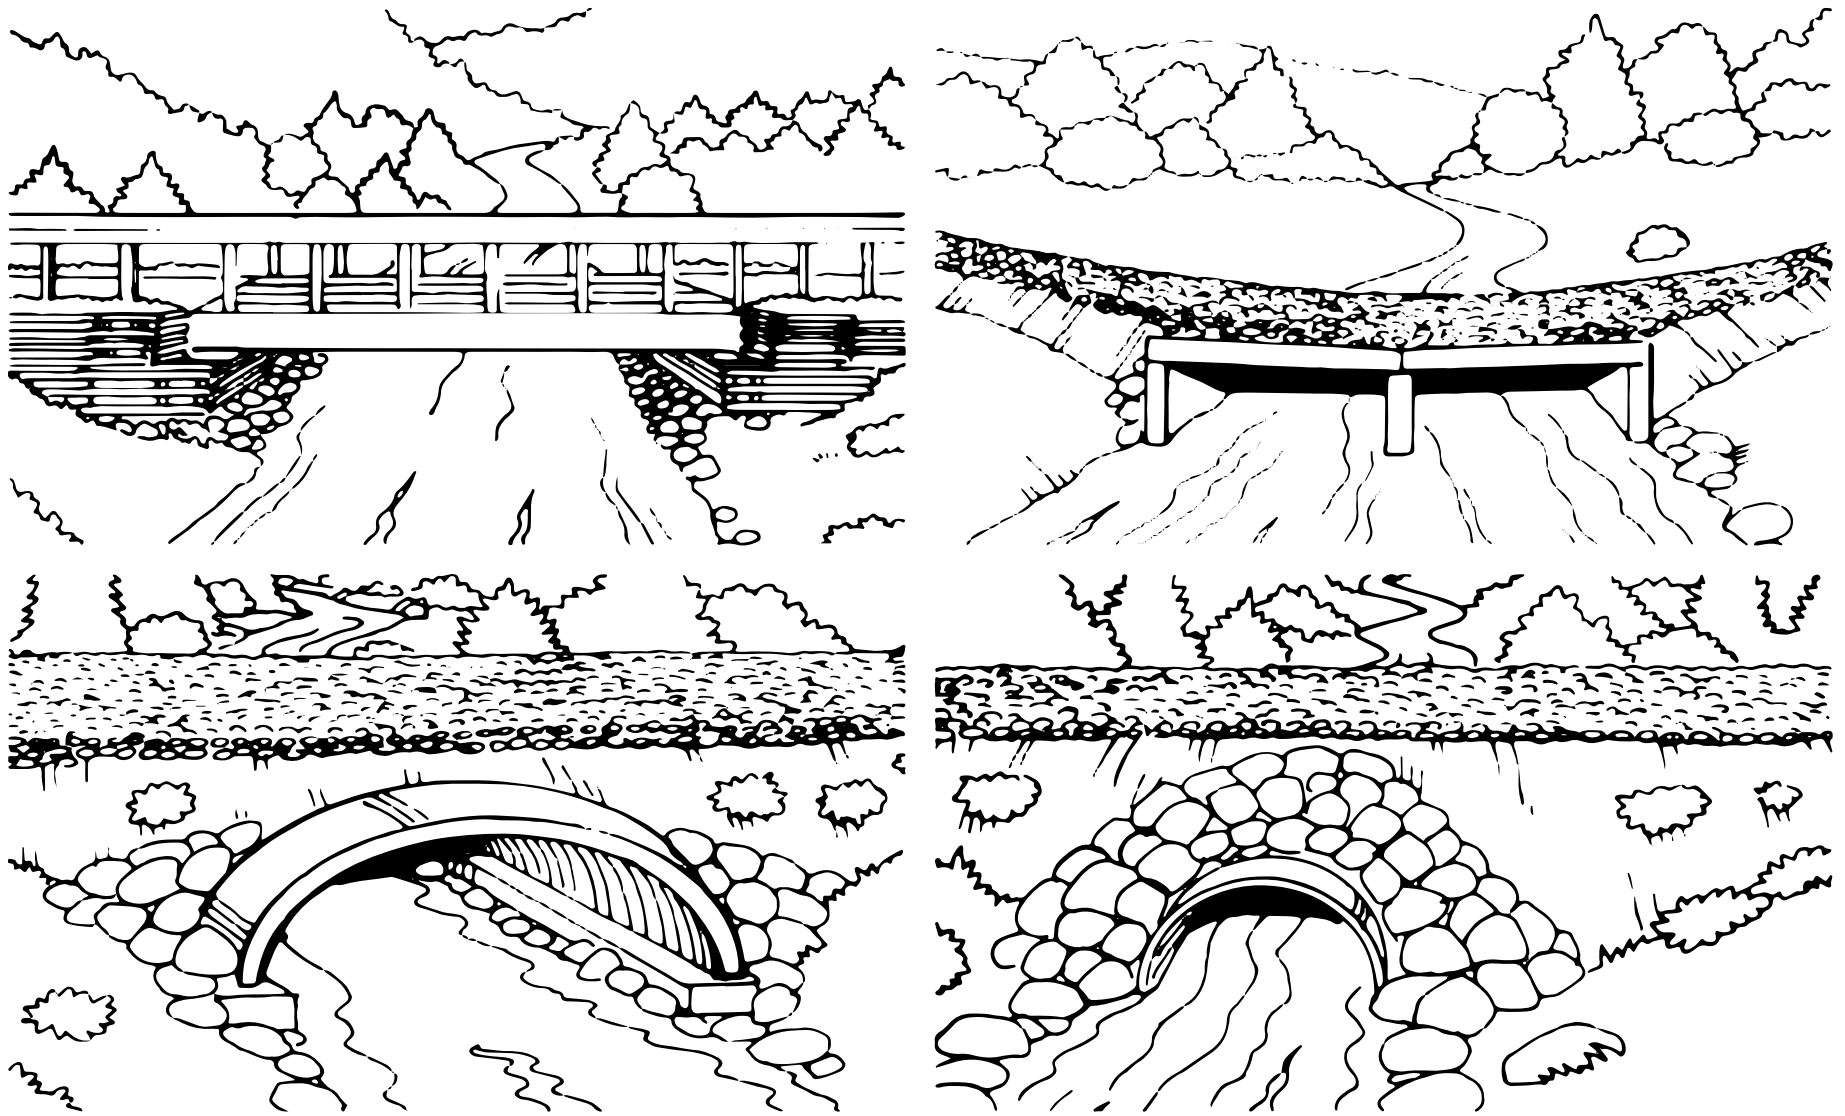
Four examples of road crossings: bridge (upper left); box culvert (upper right); bottomless arch (lower left); culvert (bottom right). Design crossing elevations to prevent downstream scouring and to prevent barriers to aquatic organism passage. These illustrations are adapted from the “Low-Volume Roads Engineering Best Management Field Guide.”
